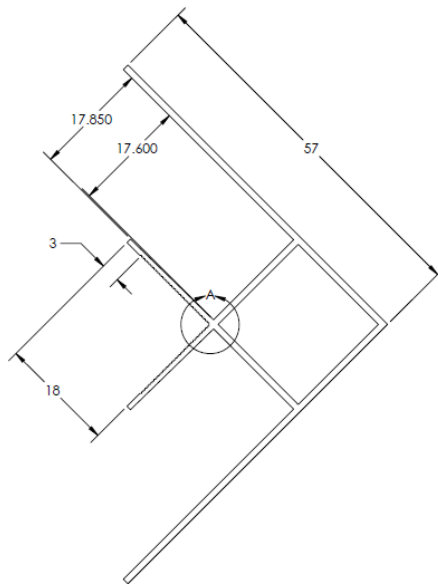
SUREWALLS DRYWALL SYSTEM—INSIDE CORNER PROFILE (3017)
